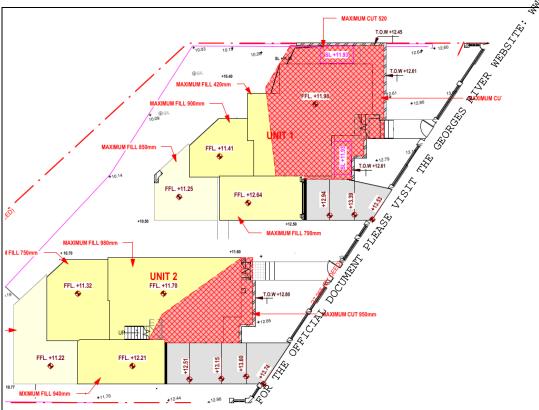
Cut and fill plan. Cut is indicated it red; fill is indicated in yellow (Source: architectural plans)
